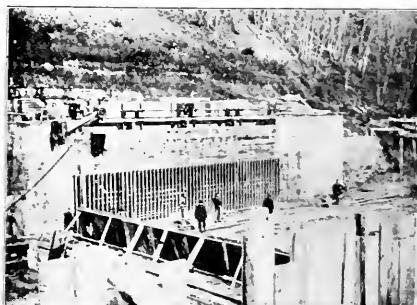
SLUICE GATE AT ENTRANCE TO HEAD RACE TUNNEL, ZUFIKON-BREMGARTEN ELECTRO HYDRAULIC INSTALLATION.
